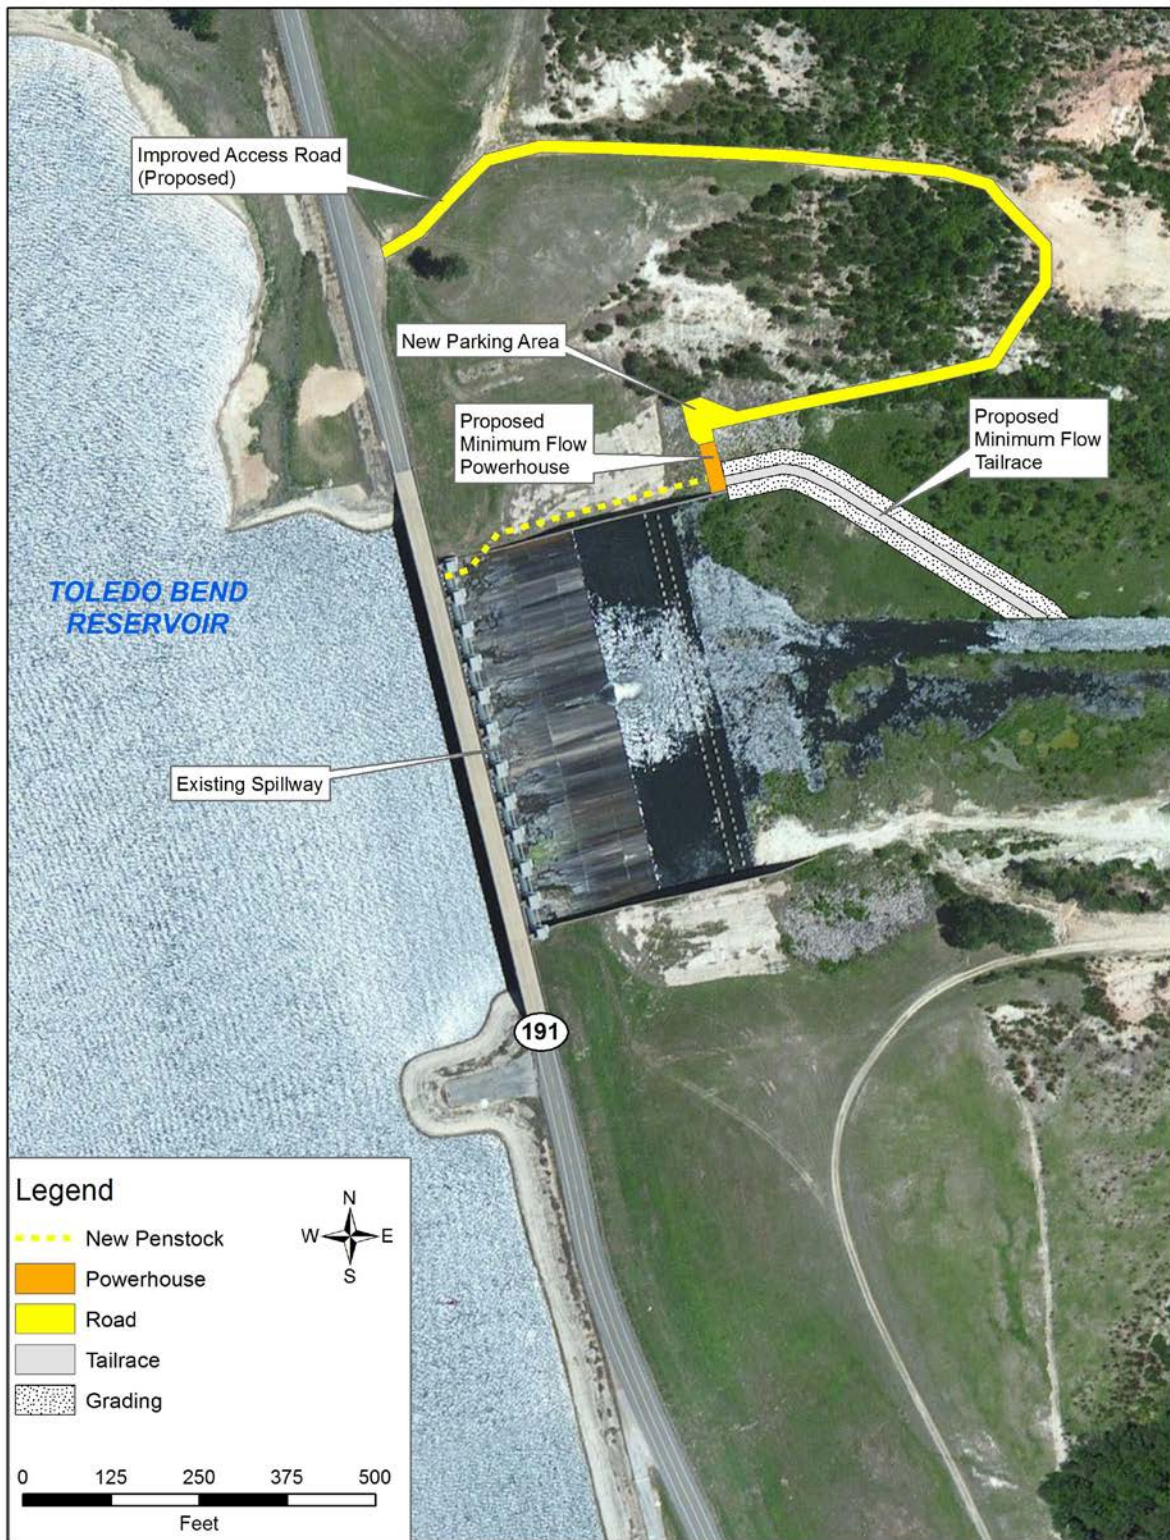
Proposed layout of the new minimum flow generating unit (Source: staff).
